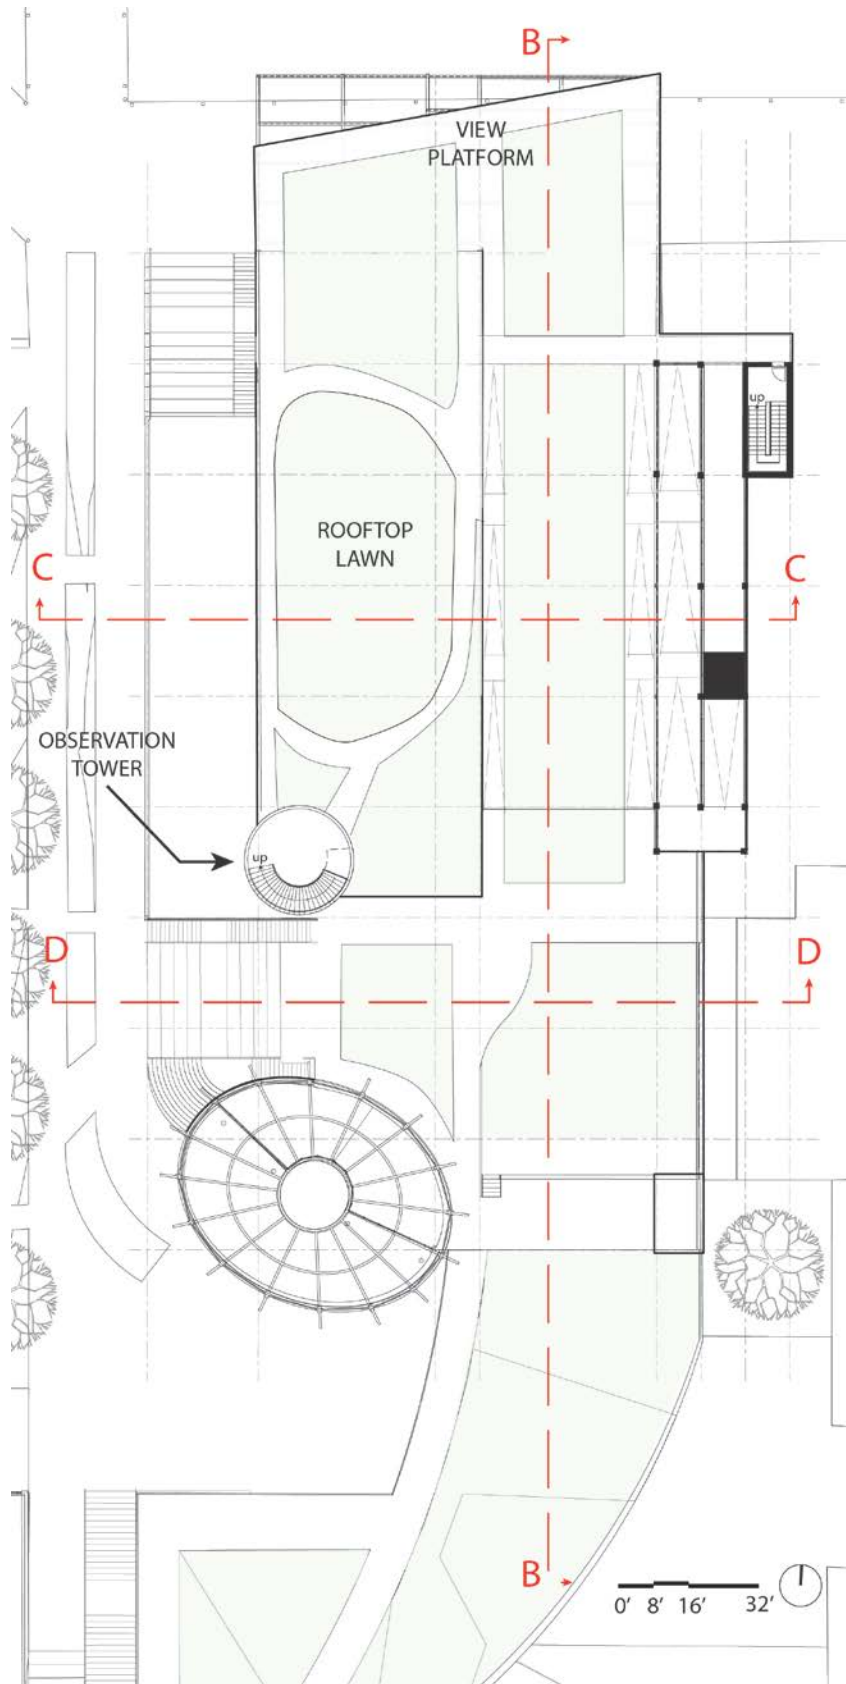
Roof plan, Museum, Final design scheme, image by author.
